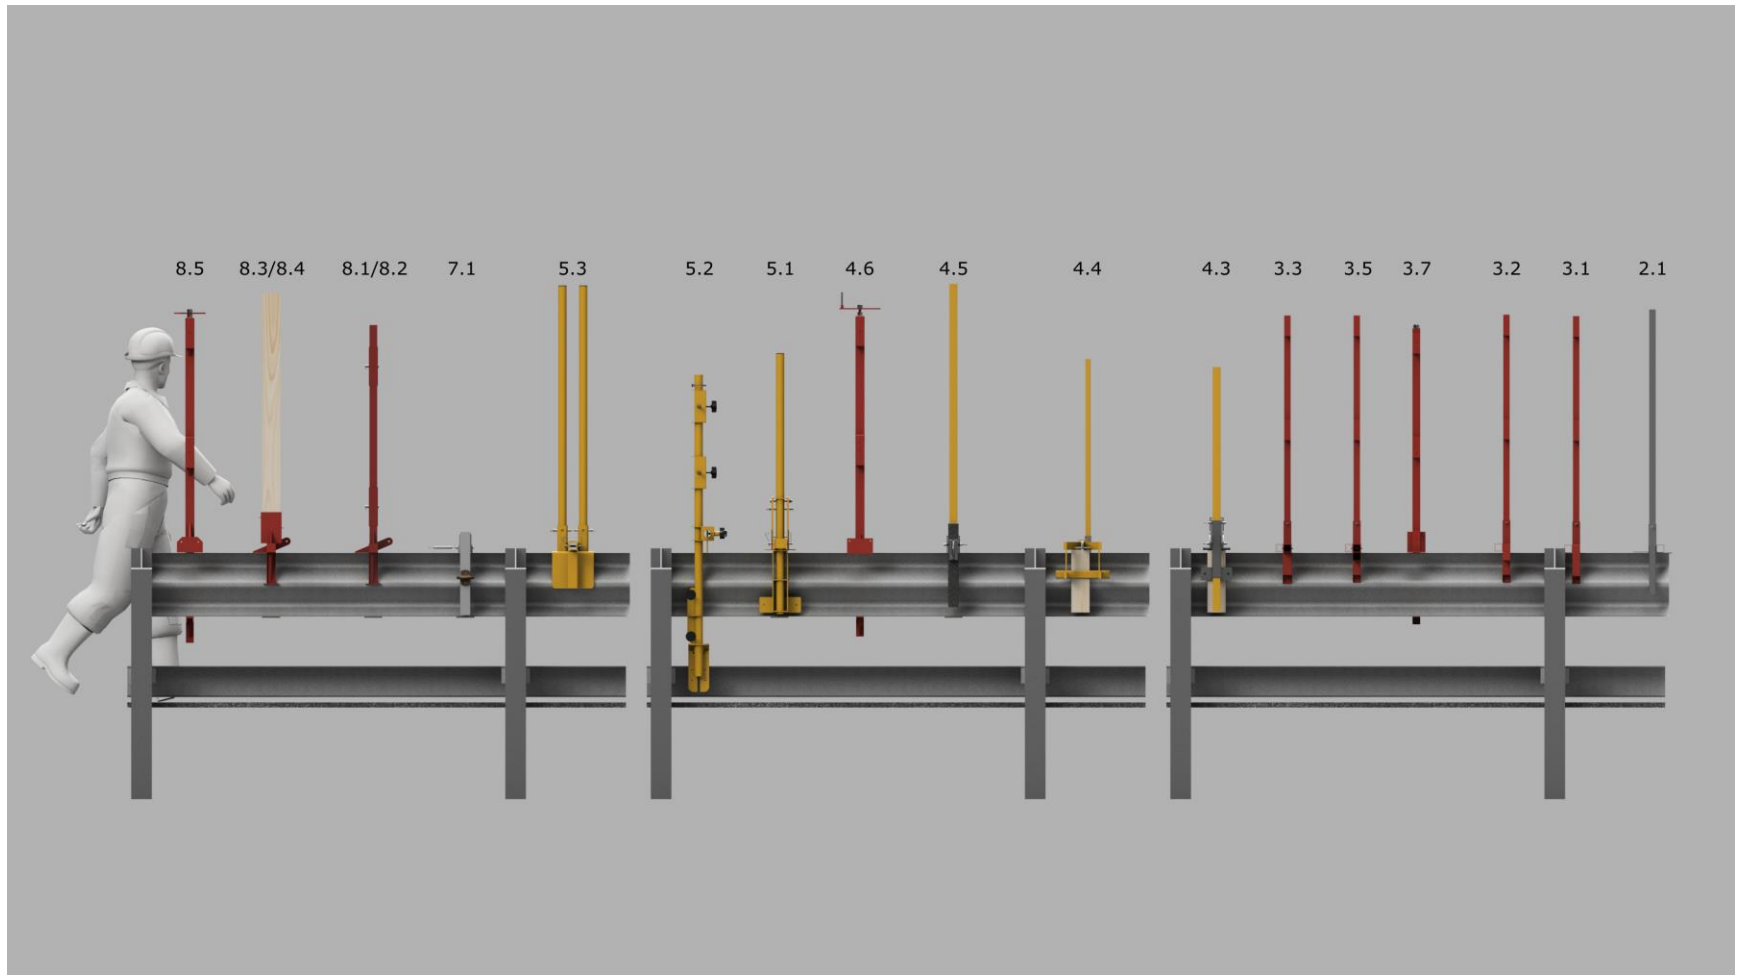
Guardrail Type 23, guardrail fit; view from the west
